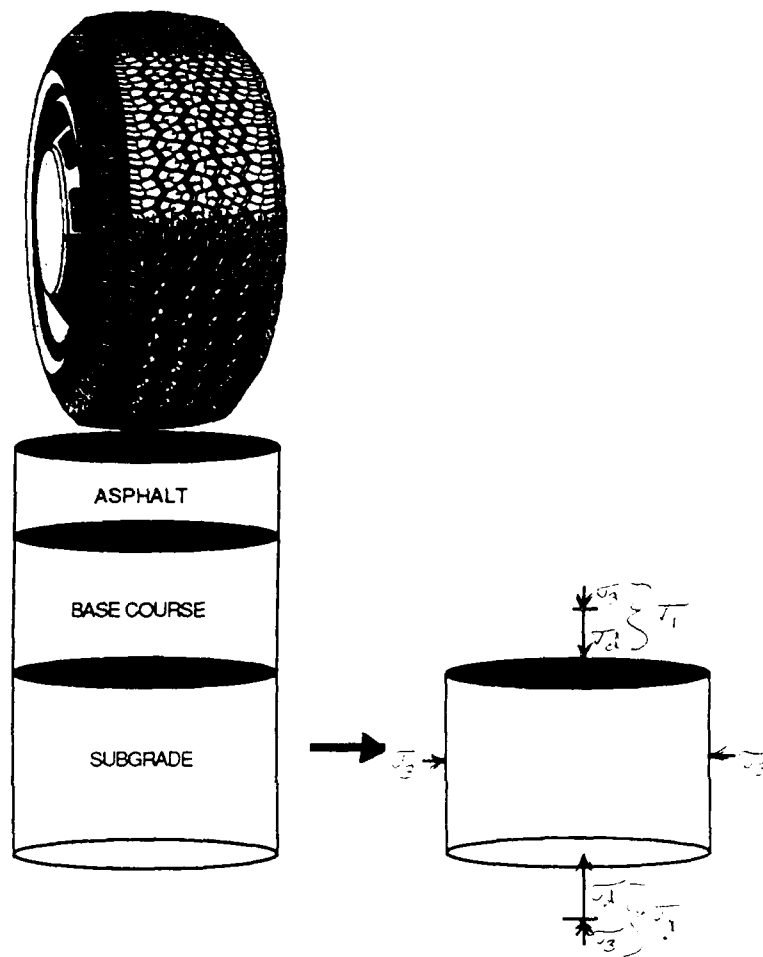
Subgrade Specimen Subjected to Confining Pressures and Axial Load
